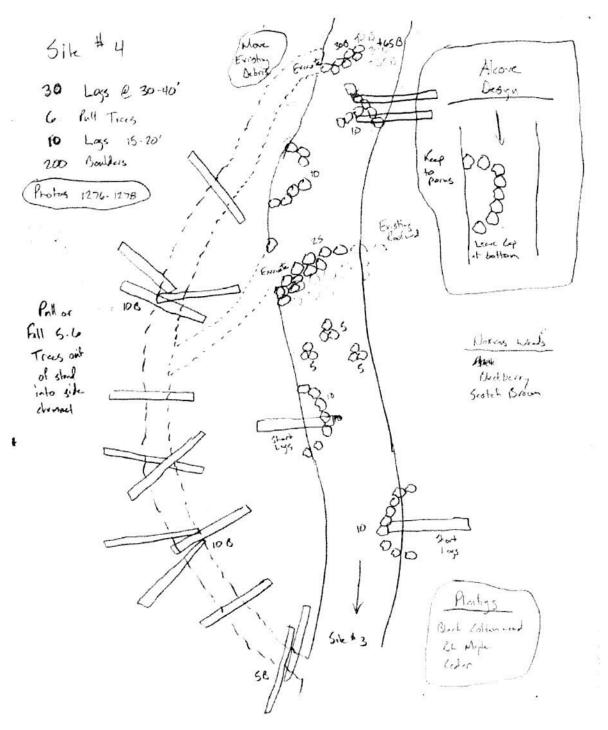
Site drawing of site #4. This is an example of side channel and mainstem Harrington Creek site designs. These sketches will be converted to a digital drawing in the near future.
